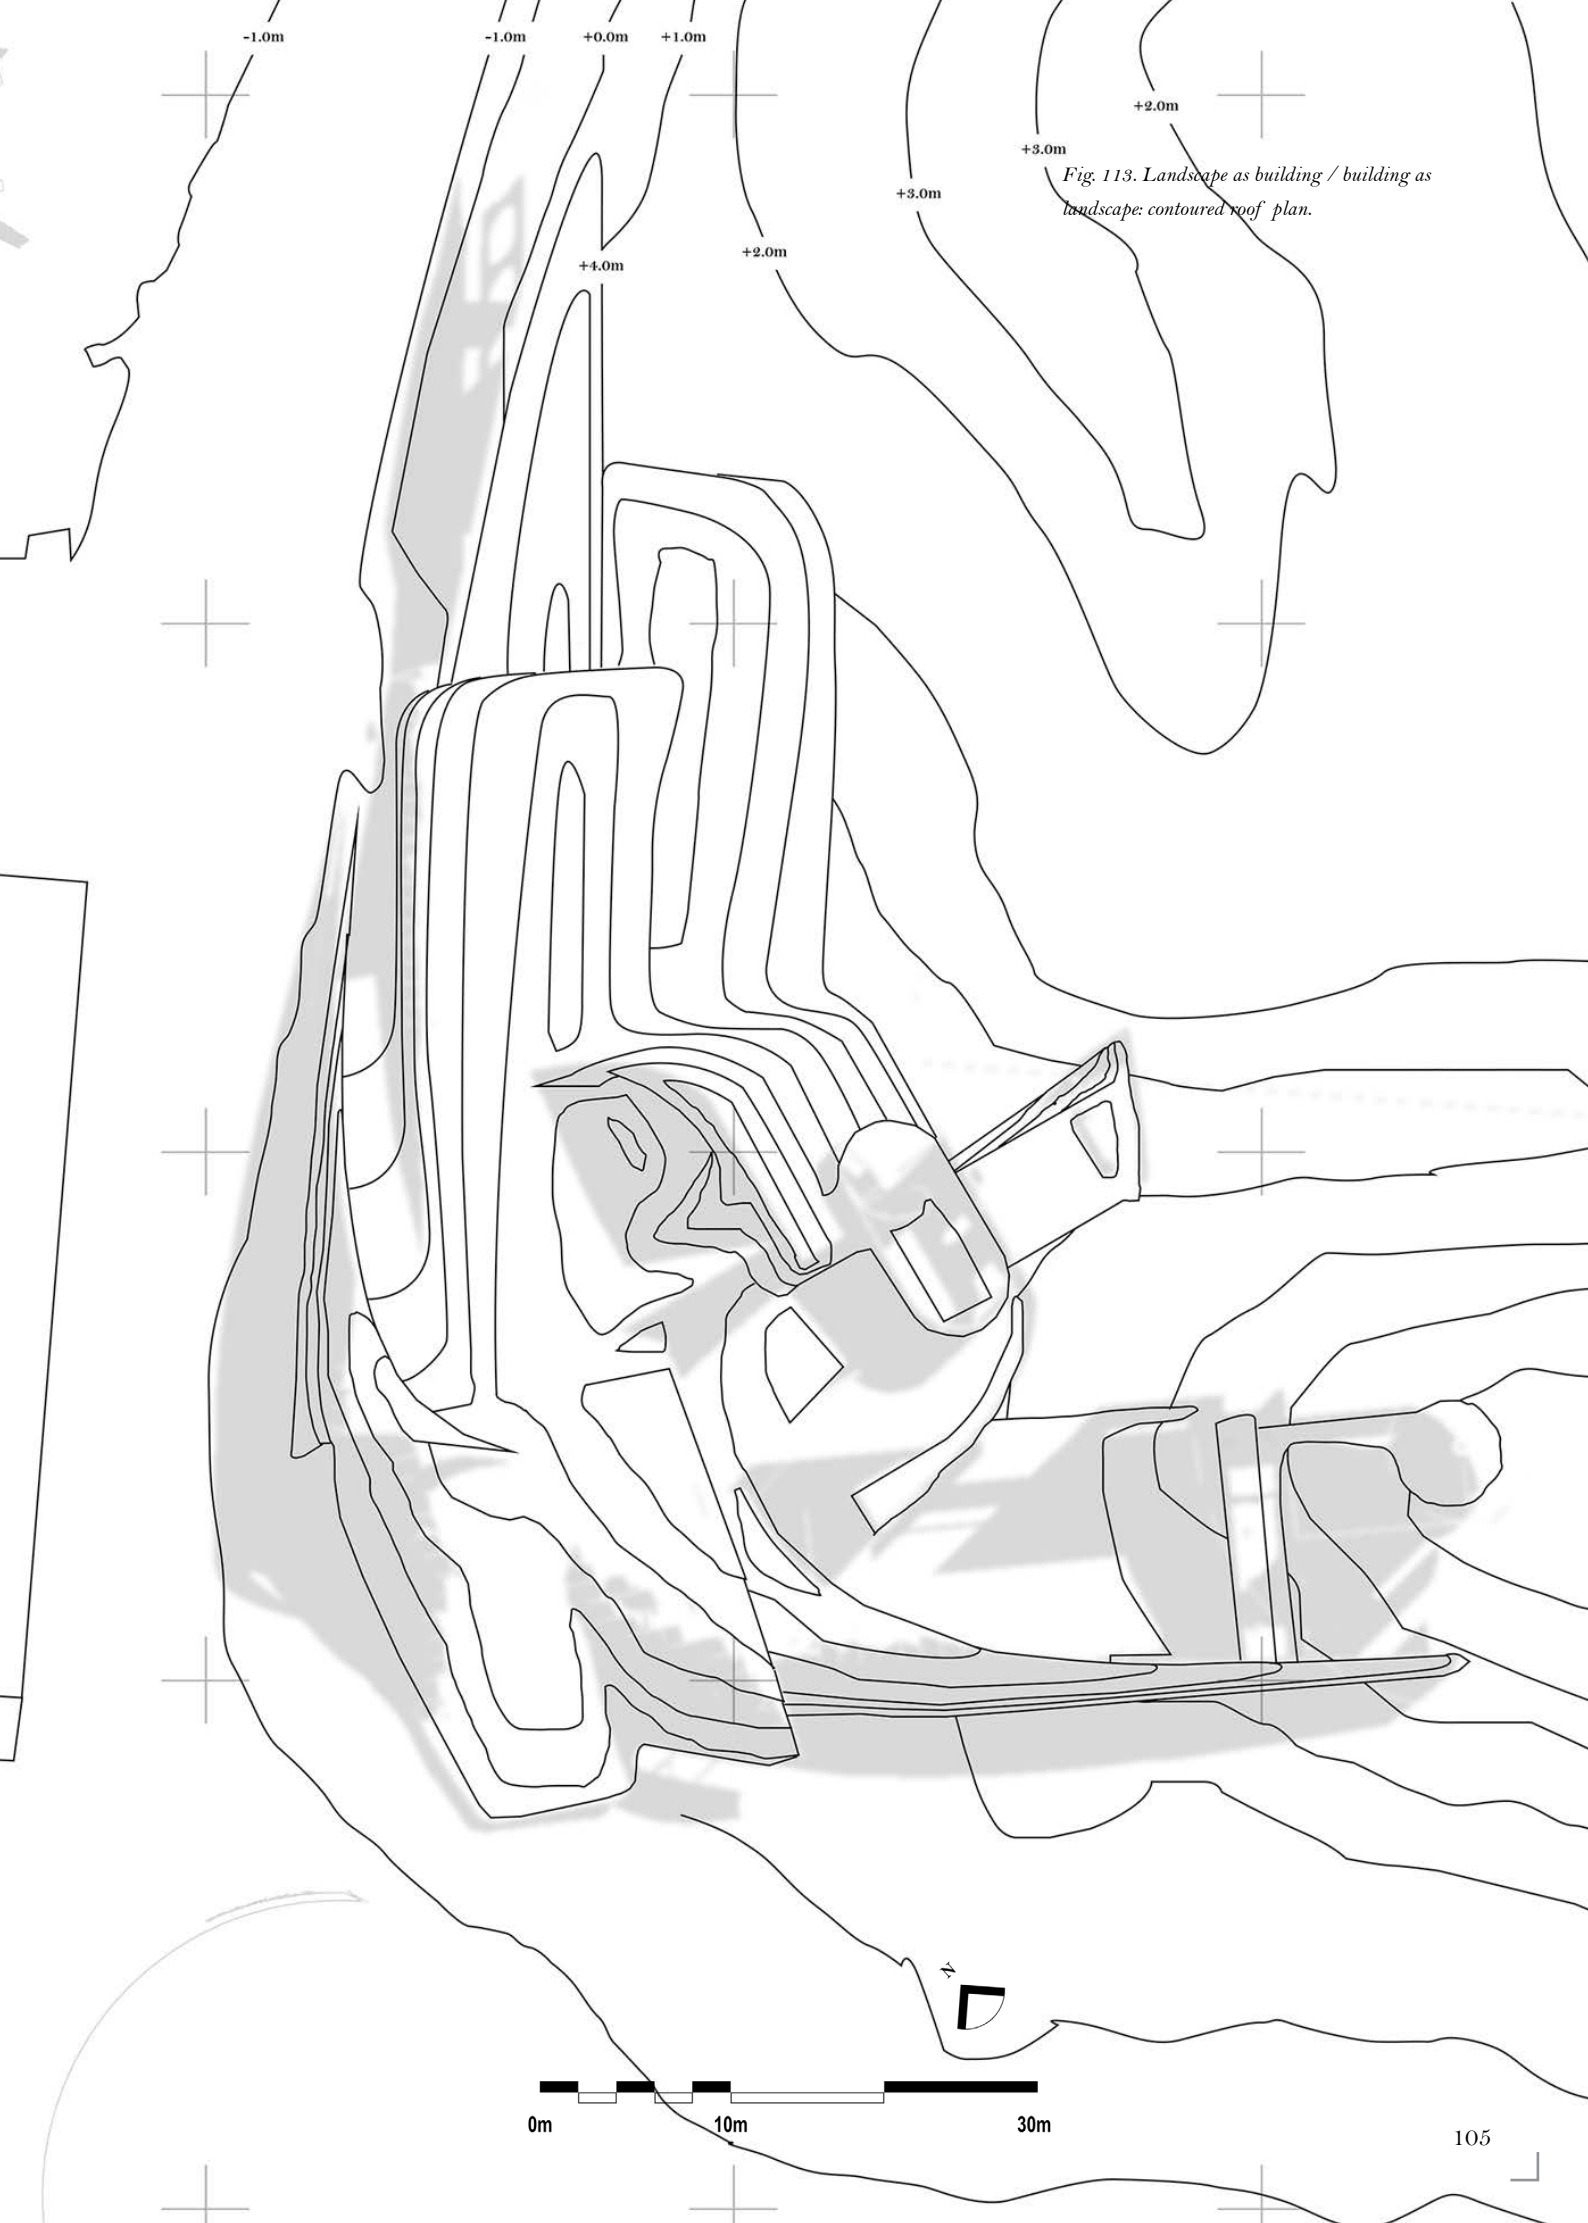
Landscape as building / building as landscape: contoured roof plan.
